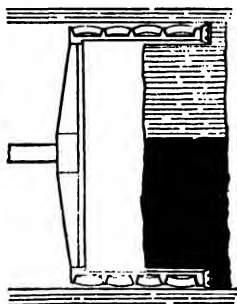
Stanley's Coal Heading Machine, showing Revolving Boring Head, with Cutters
